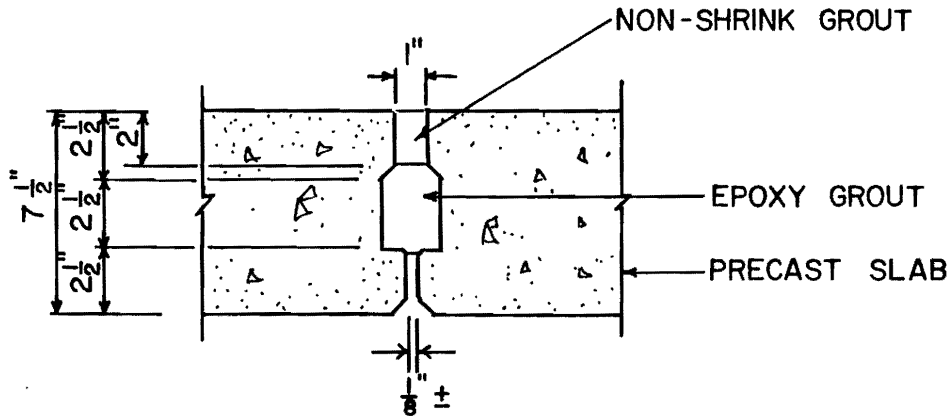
Roundout Creek Bridge Deck, Kingston, New York. New York State Department of Transportation (17).
